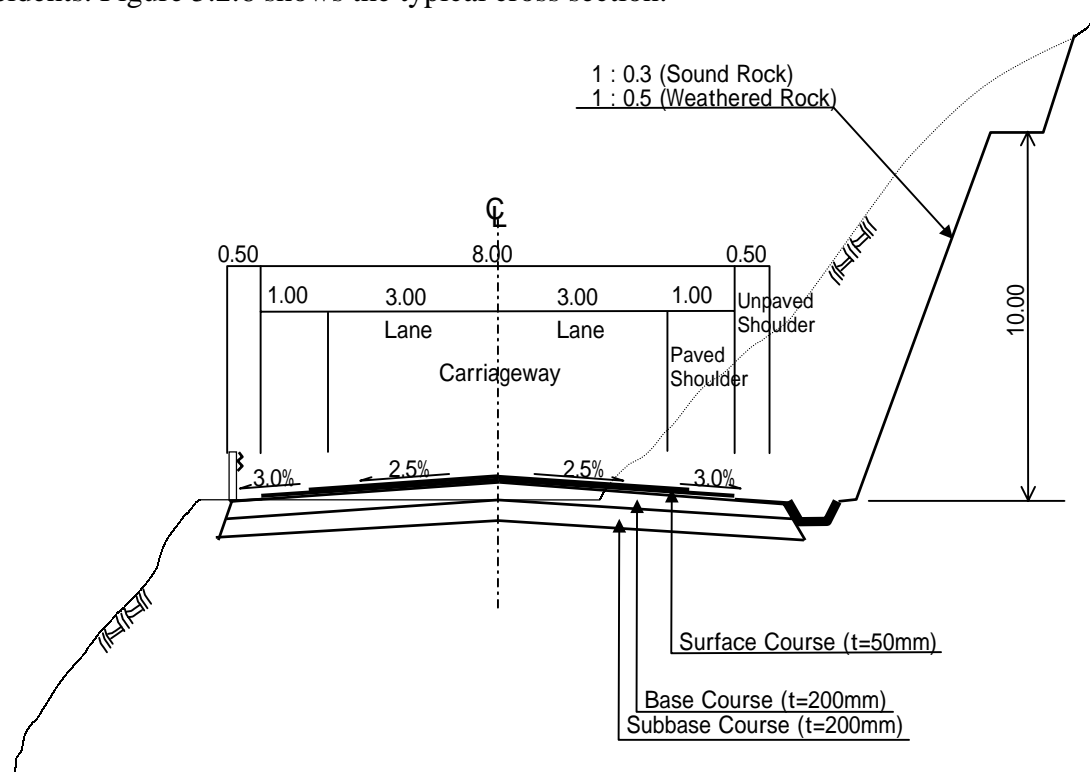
Typical Cross Section for Proposed Route (L = 15.80km)
